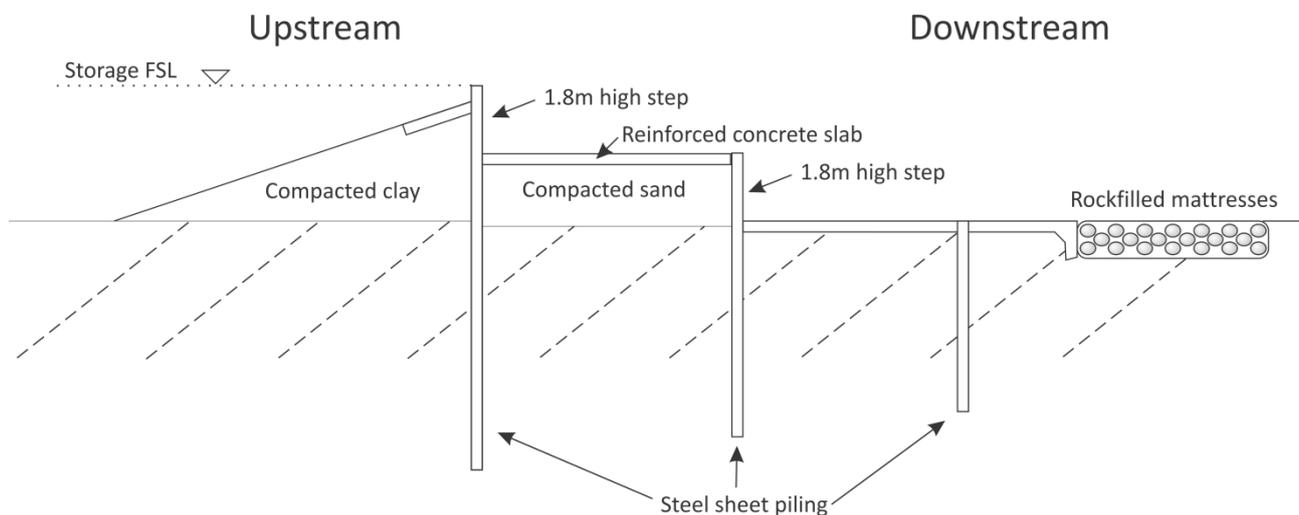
Schematic cross-section diagram of sheet piling weir
